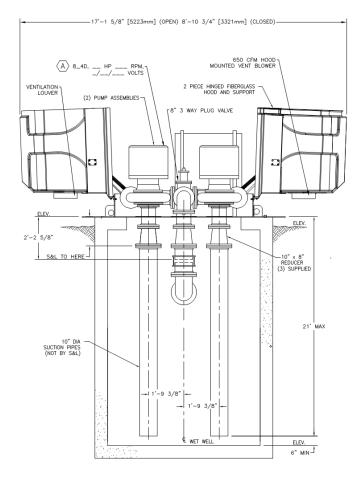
Detail Drawing of Above Ground Suction Lift Pump Station
